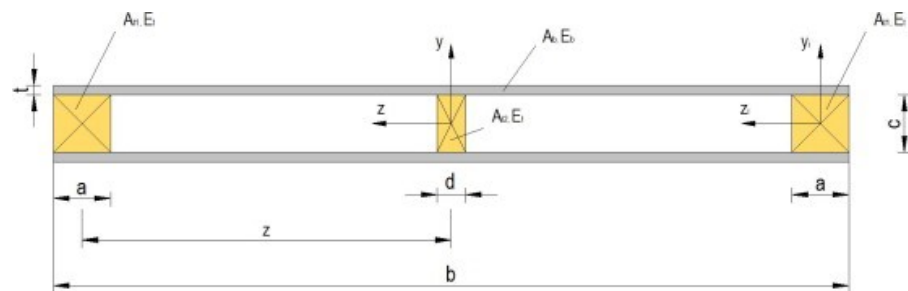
Cross-section of a typical timber-framed wall with a two-sided sheathing board [20].
